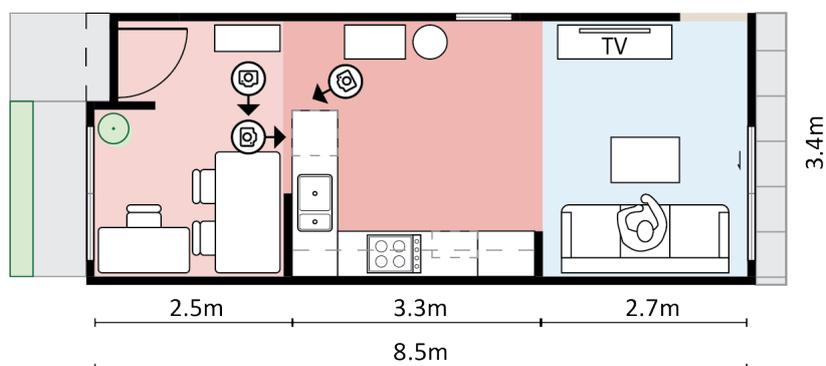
Lounge as part of an open plan kitchen, dining, lounge space
